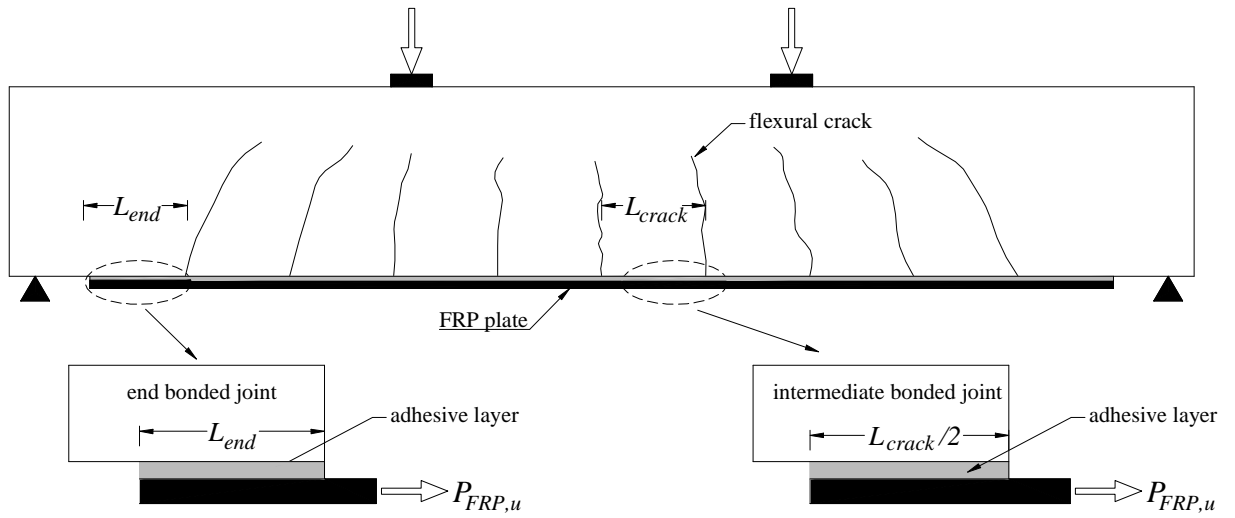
Location of bonded joints in cracked FRP strengthened RC beam.
